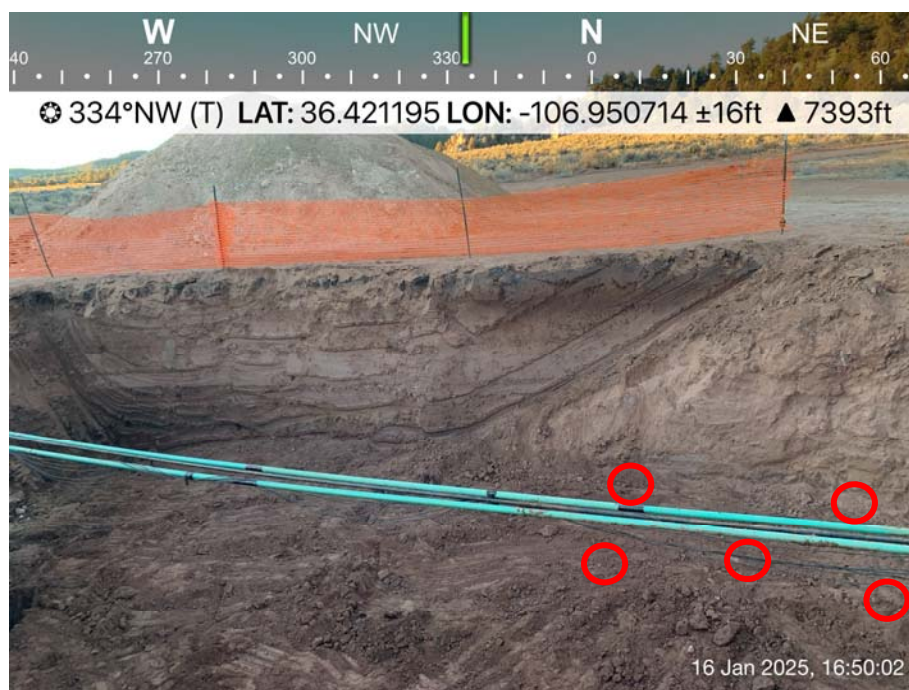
SS15 collected as a five-point composite sample from northeast base of excavation.
